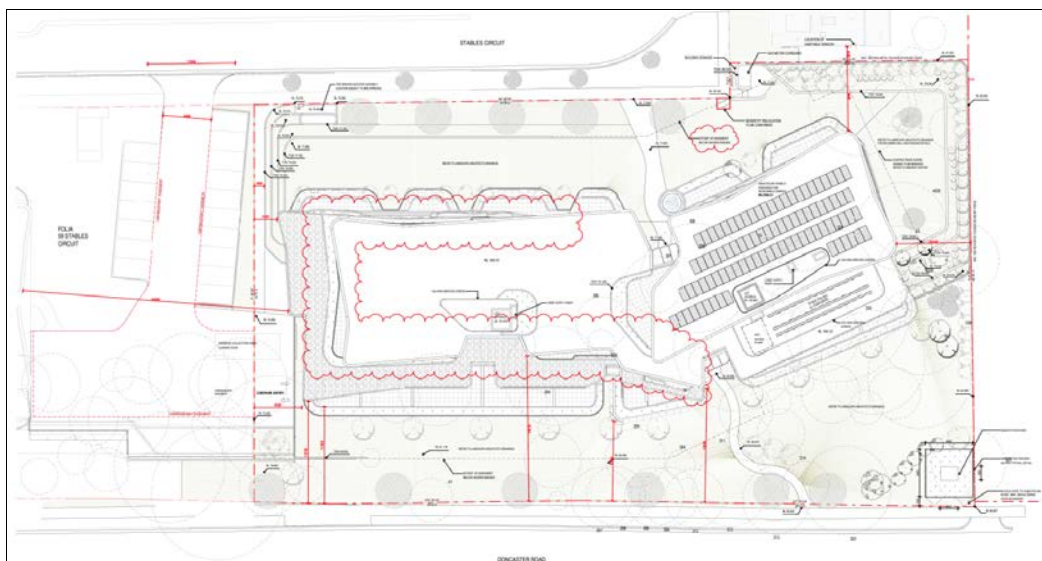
Site plan depicting future lot area of south-eastern portion of the Tullamore estate (including shared central accessway with Folia – to the west)
